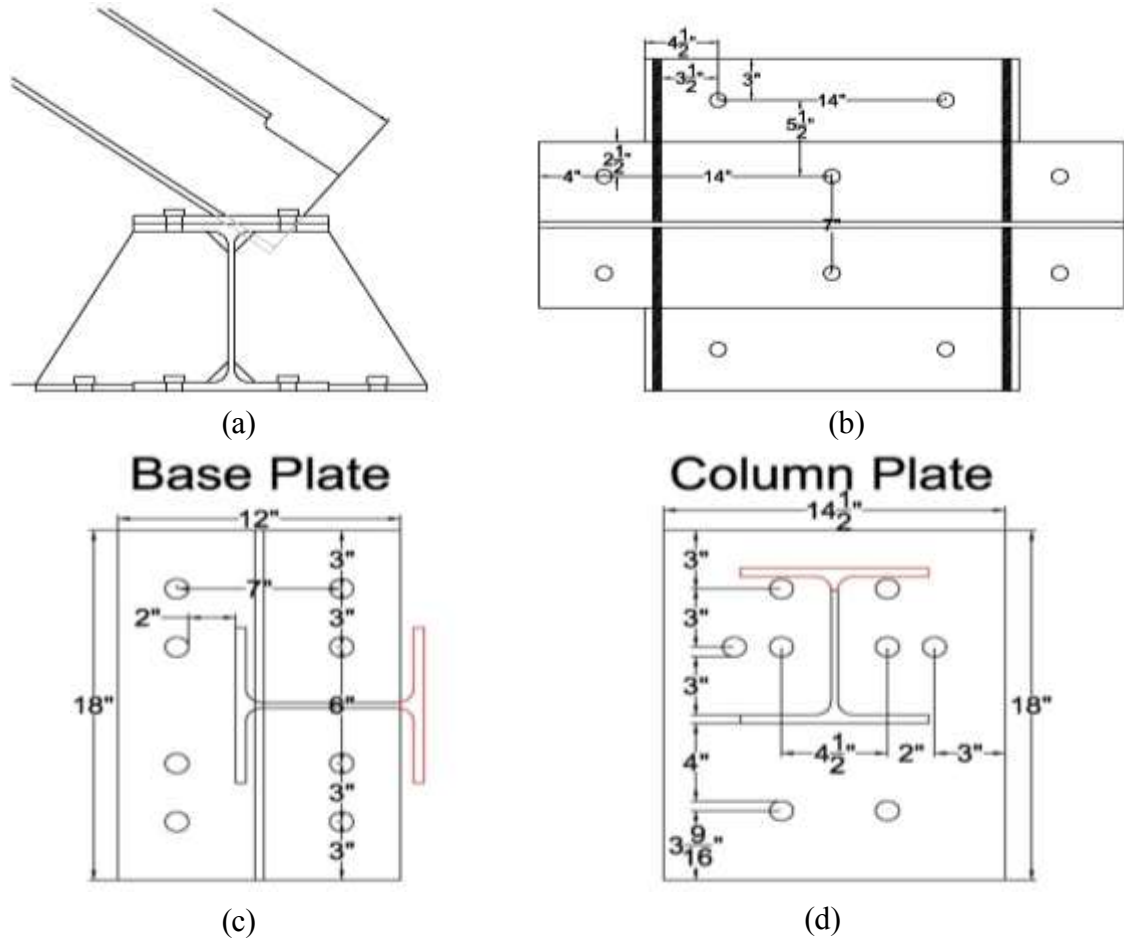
Strut Attachment: (a) Side View of for Strut Base Support; (b) Plan View of Strut Base Support; (c) Base Connection Plate; (d) Column Connection Plate
